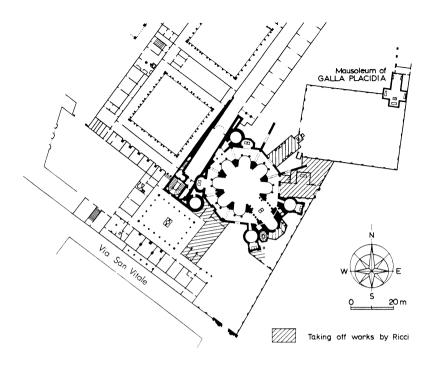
Plan by Fiandrini (1798) showing buildings erected against S. Vitale basilica
